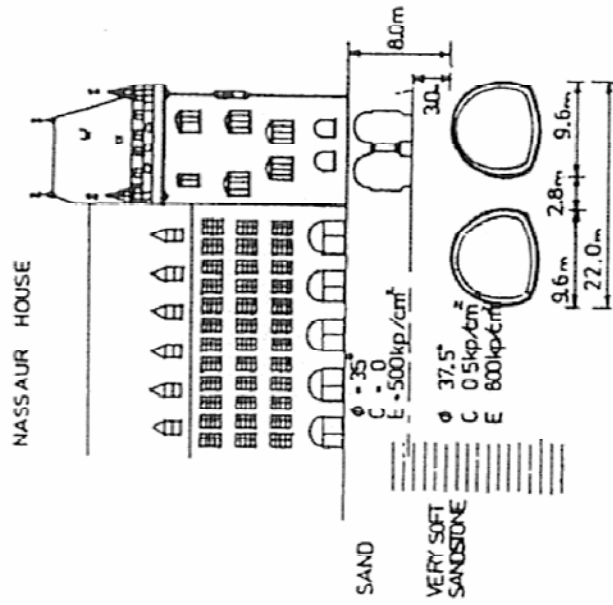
Subway station in Nürnberg, Germany formed using the New Austrian Tunneling Method.<sup>28</sup>
